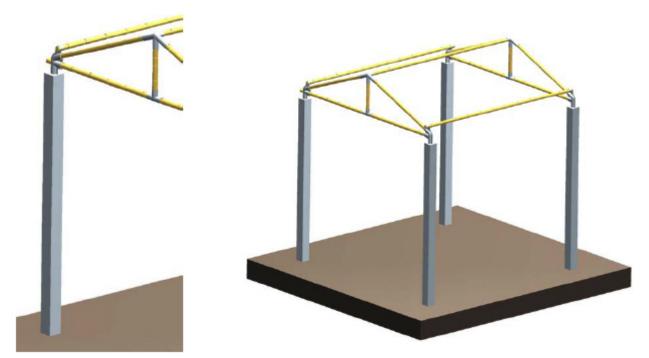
Cement Casted Bamboo Composite Pole Column is grouted in the plinth
